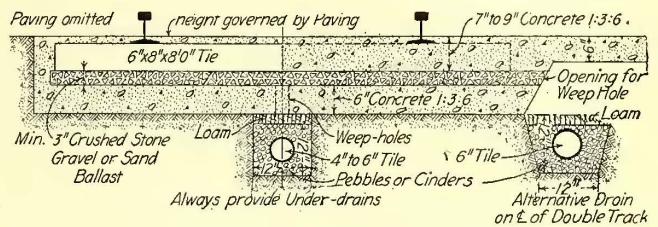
"TYPE C" CONSTRUCTION FOR HEAVY WATER-RESTRAINING SOILS AND OTHER UNCERTAIN MADE GROUNDS
